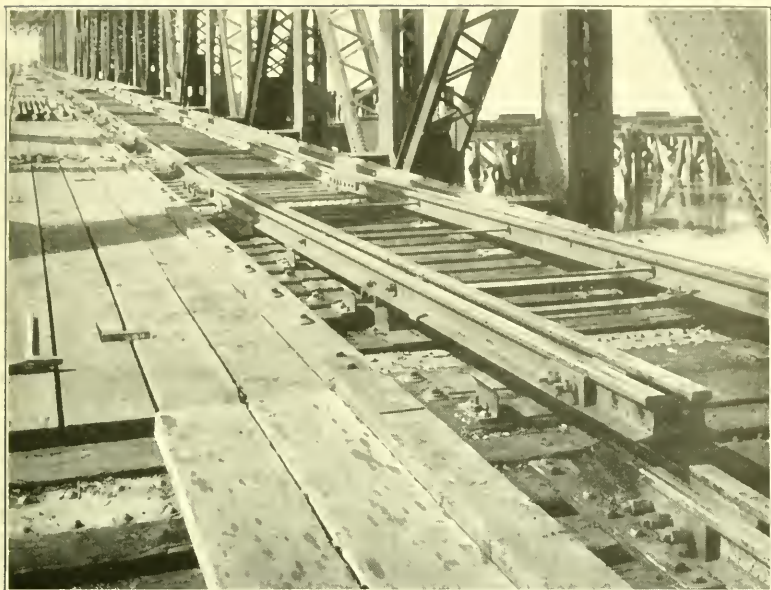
LIFT RAILS, DUMBARTON POINT BRIDGE.
